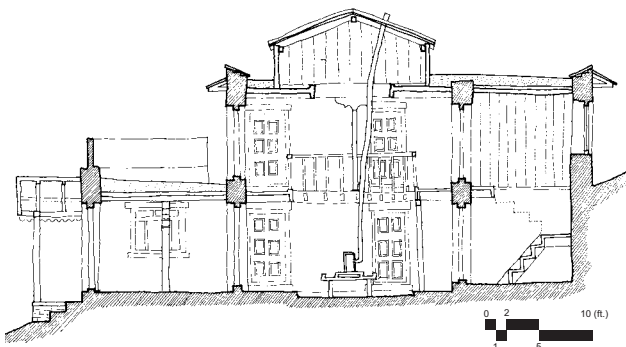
Yak Ryu hotel: longitudinal building section.
